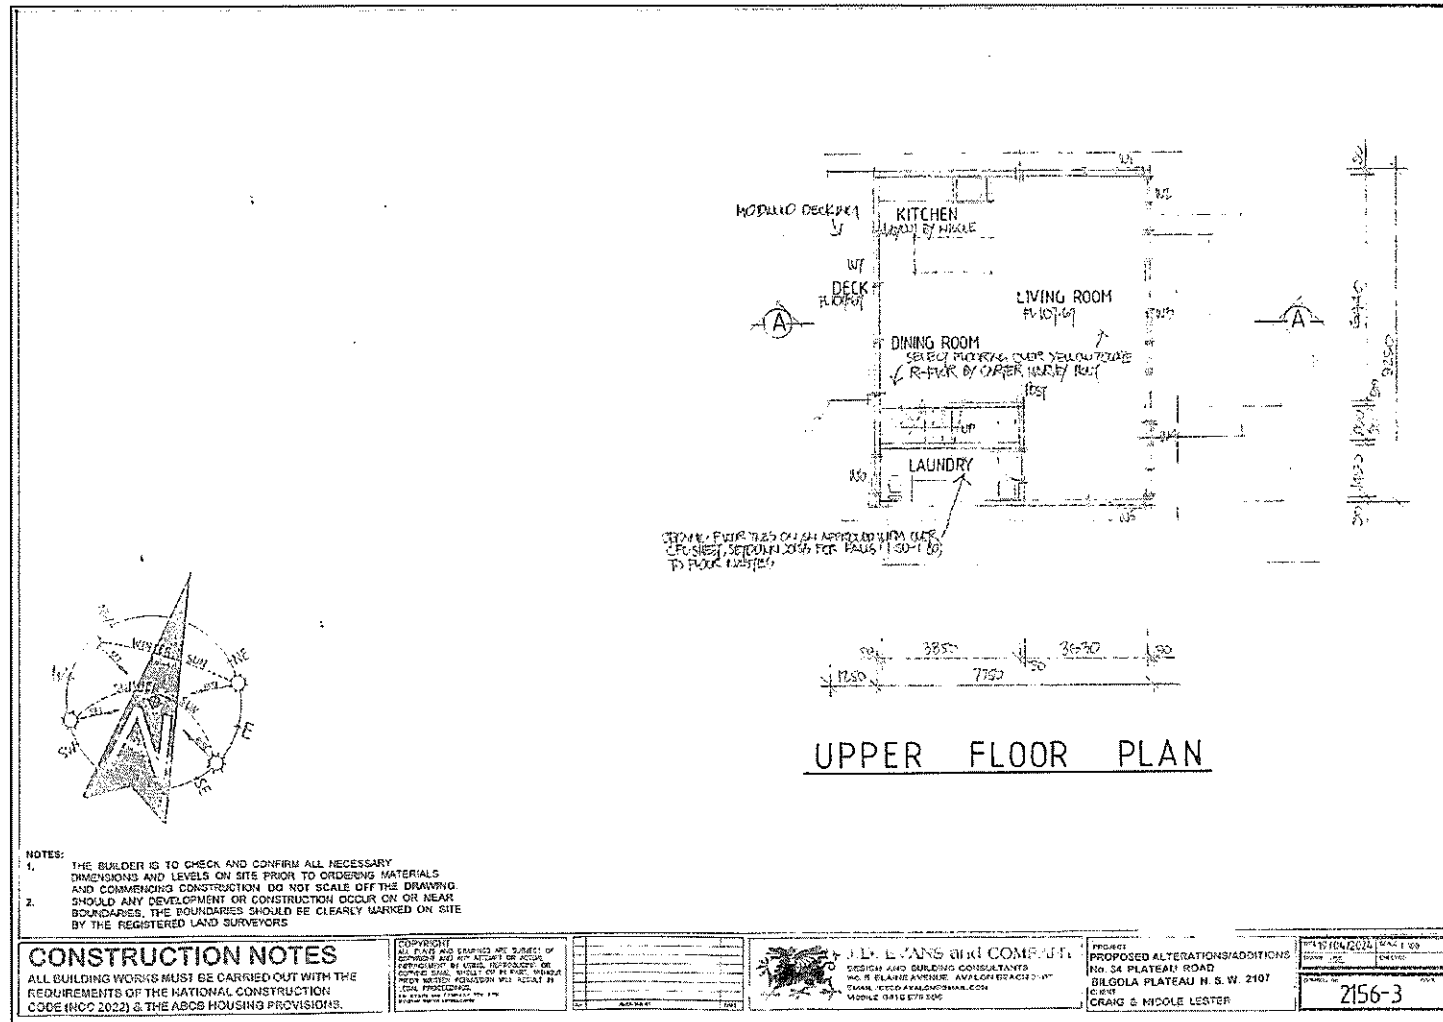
ILLUSTRATES PROPOSED UPPER FLOOR PLAN
